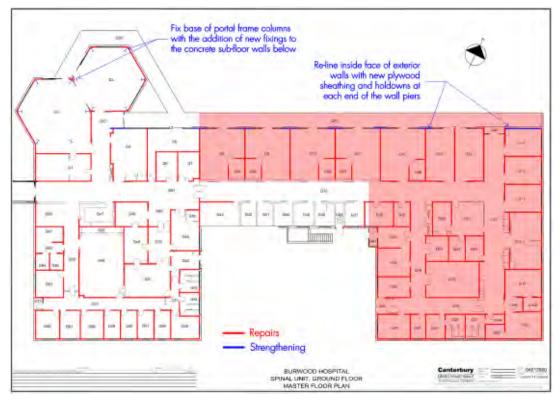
Ground Floor Plan – Strengthening Recommended
